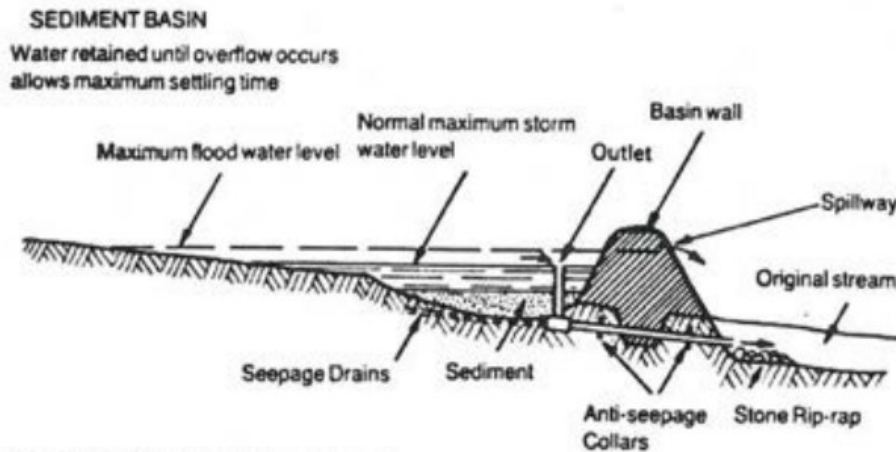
SEDIMENTATION BASIN LAYOUT (RES GROUP 2017)
